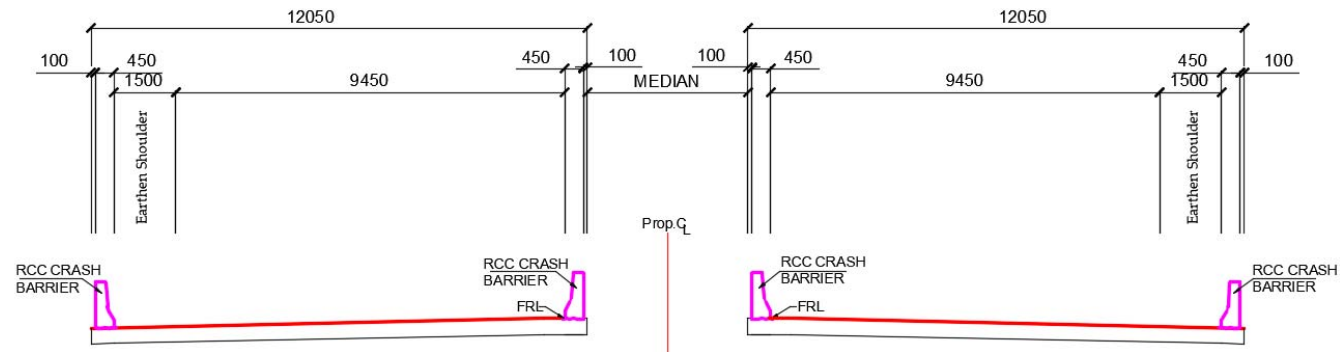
4-Lane Slab/ Box Culvert at Road Level (TCS-15)
